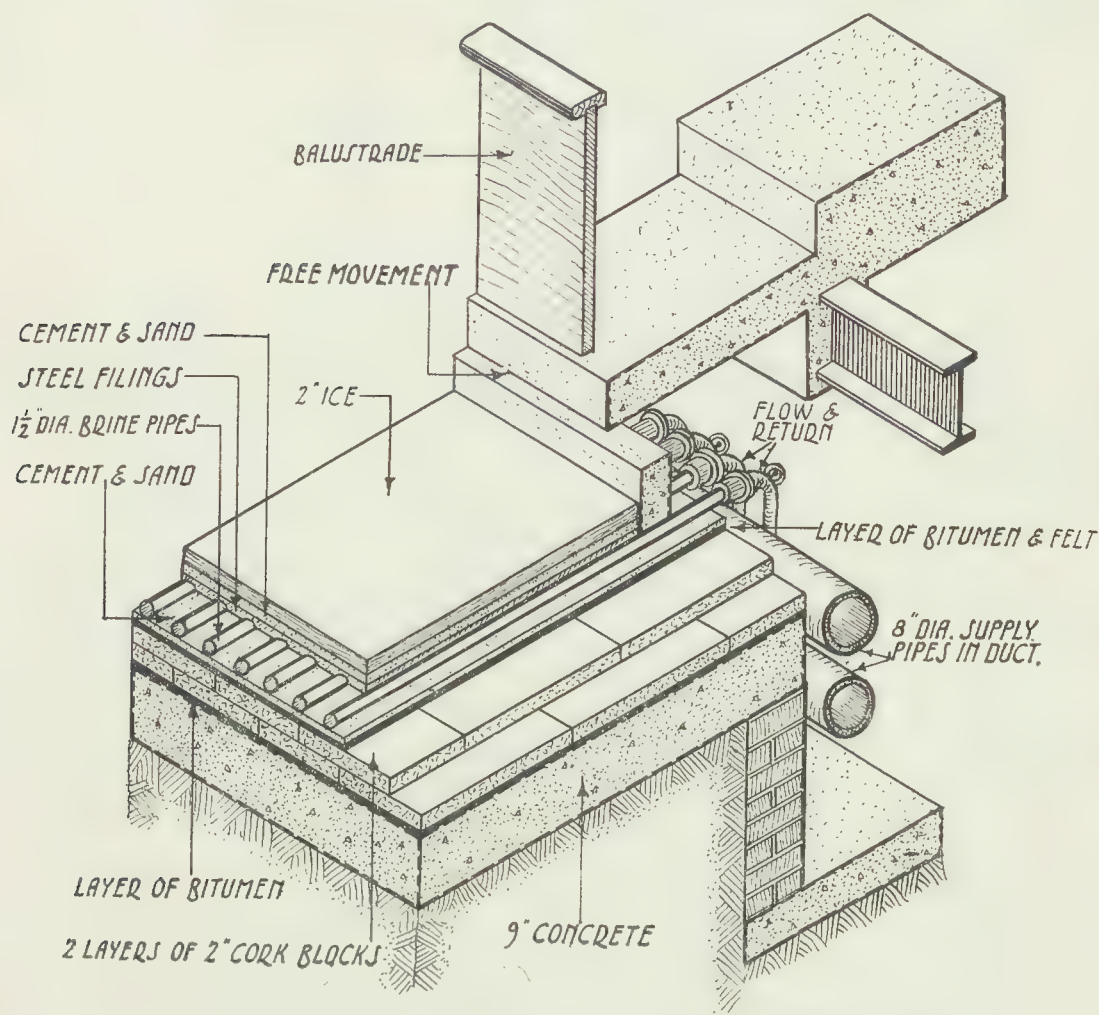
CONSTRUCTION OF ICE FLOOR SHOWING ARRANGEMENT OF BRINE PIPES
